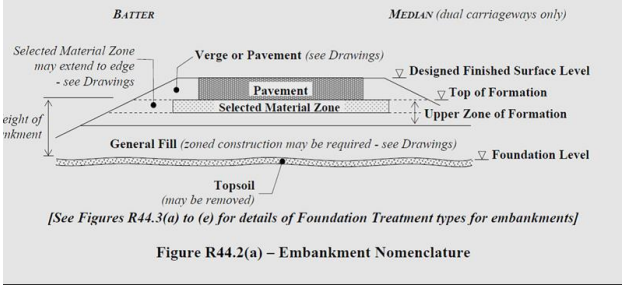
Figure R44.2(a) from RMS' Guide to QA Specification R44 Earthworks
